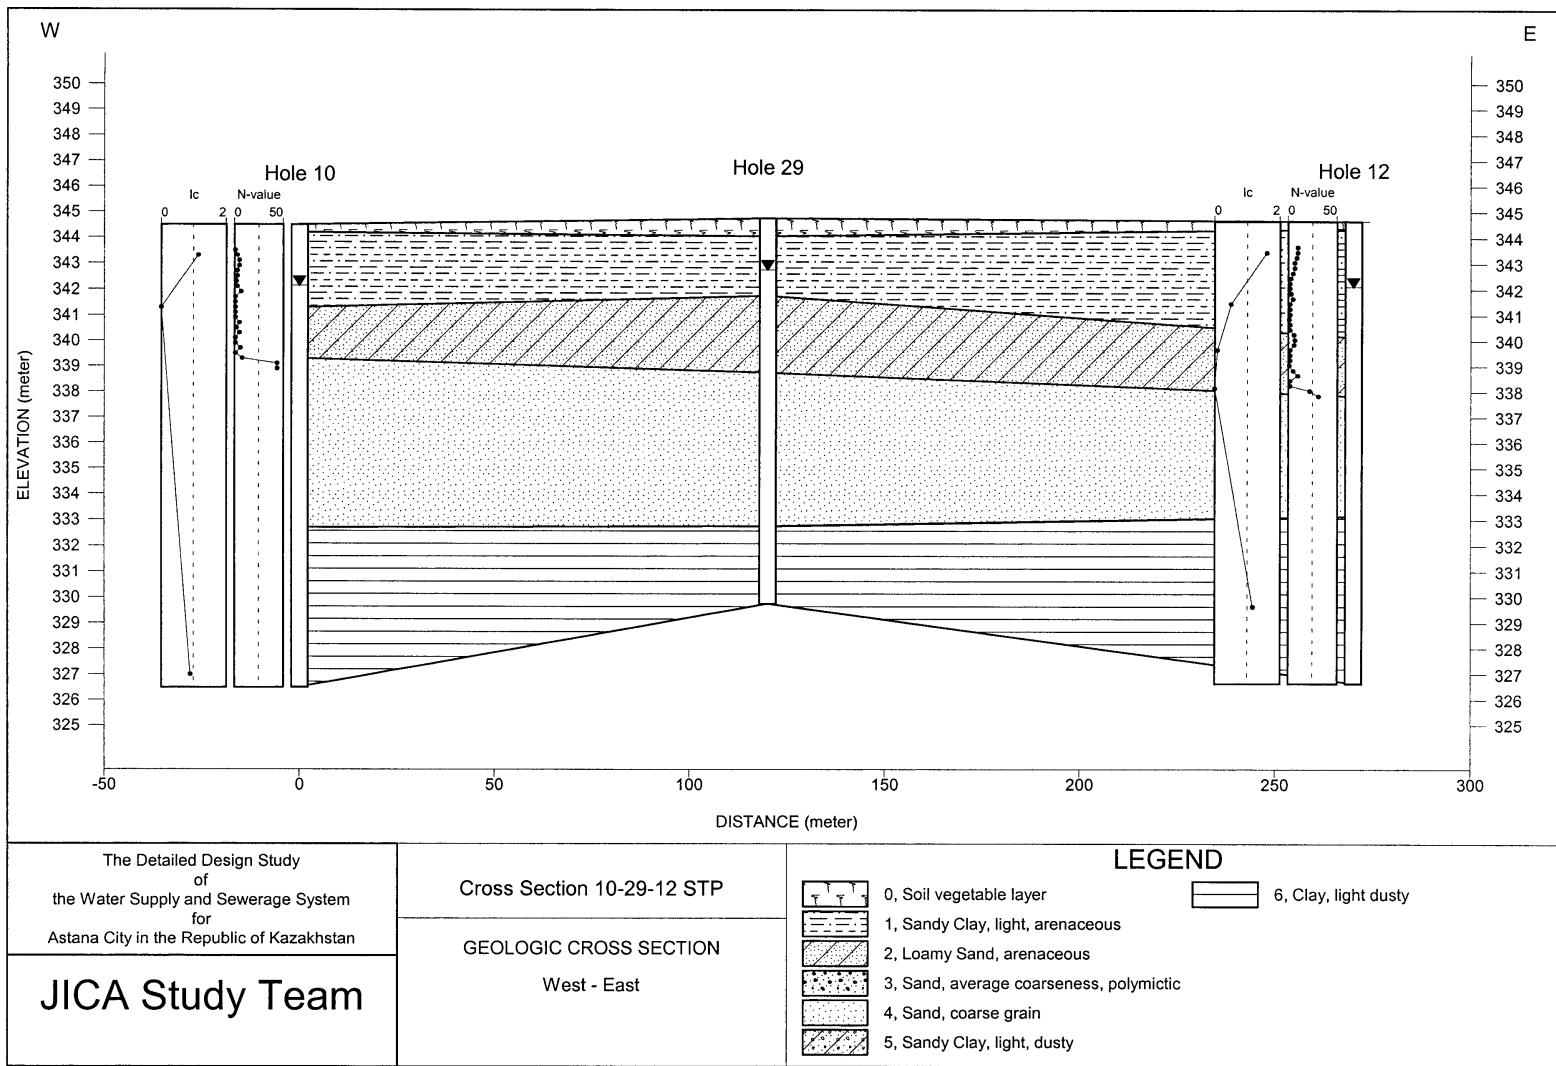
(1) Geological Cross Section at Sewerage Treatment Plant (1/9, Line No. 10-29-12)
